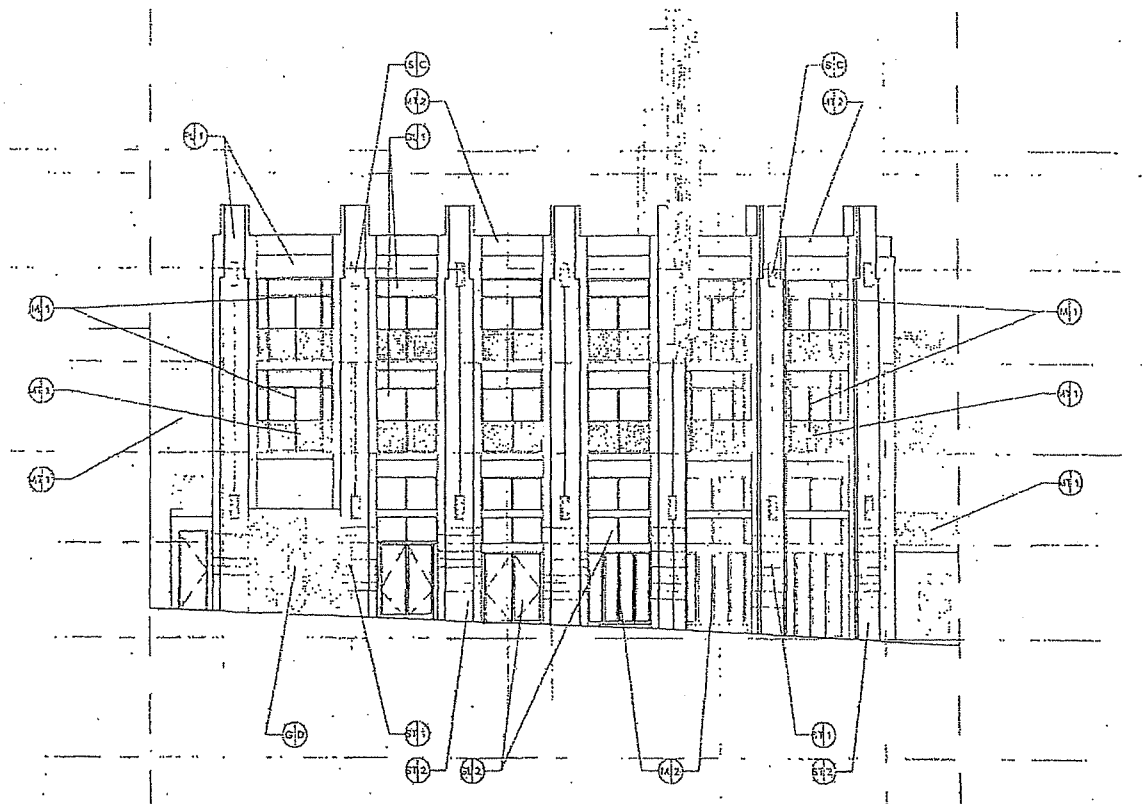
PROPOSED 1731 POWELL ST EAST (COLUMBUS AVENUE) ELEVATION.
